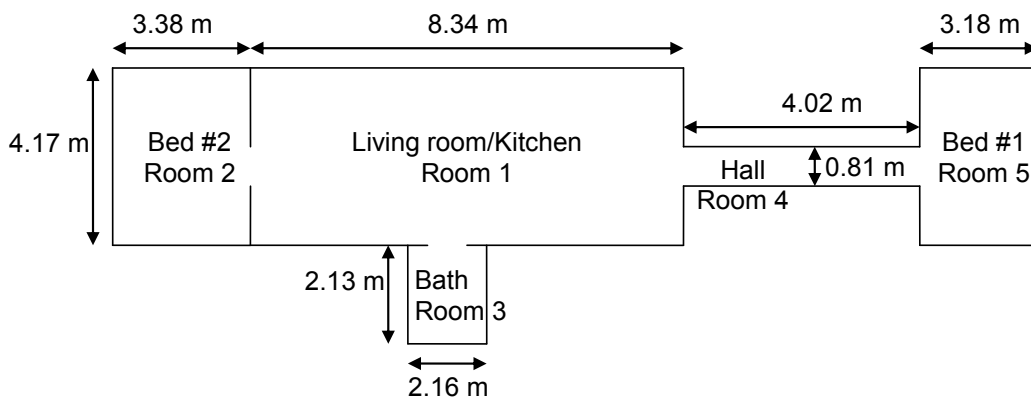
Schematic of the layout of the manufactured house used in BRANZFIRE
